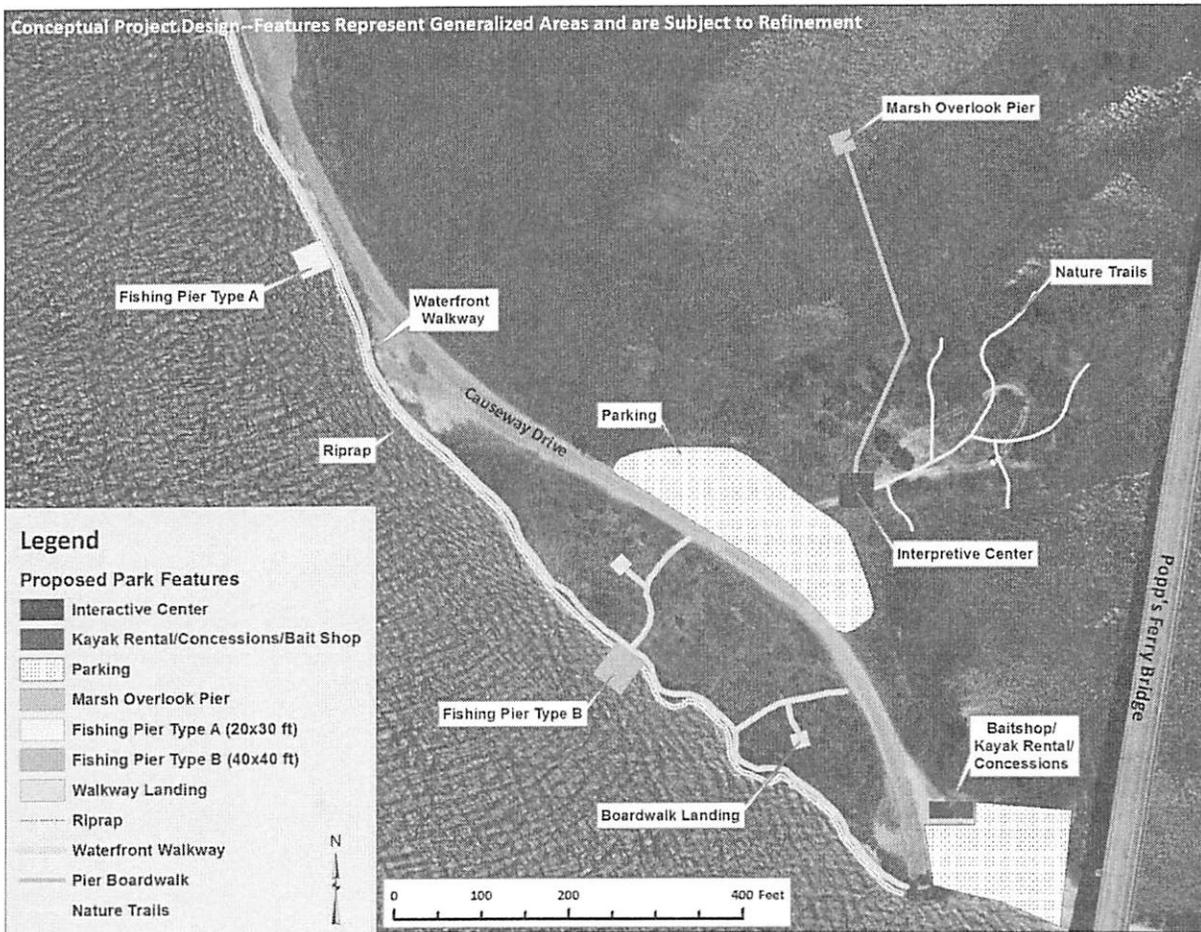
Proposed Popp's Ferry Causeway Park conceptual plan.
